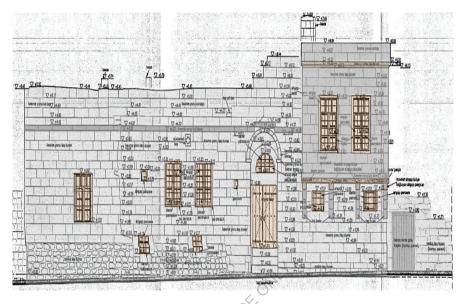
Başak Güntan House West Facade (Cultural Heritage Protection Report, 2013)
